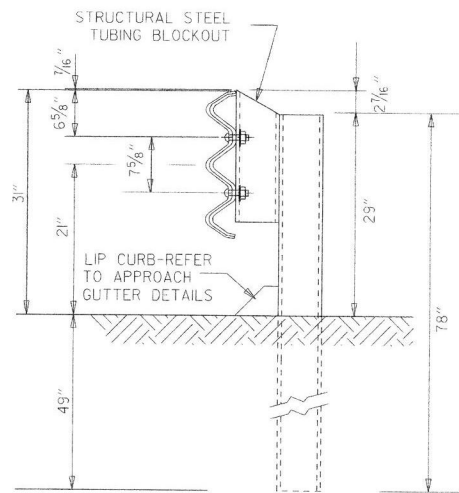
DETAILS SHOWING POSITION OF GUARD RAIL ON HIGHWAY
